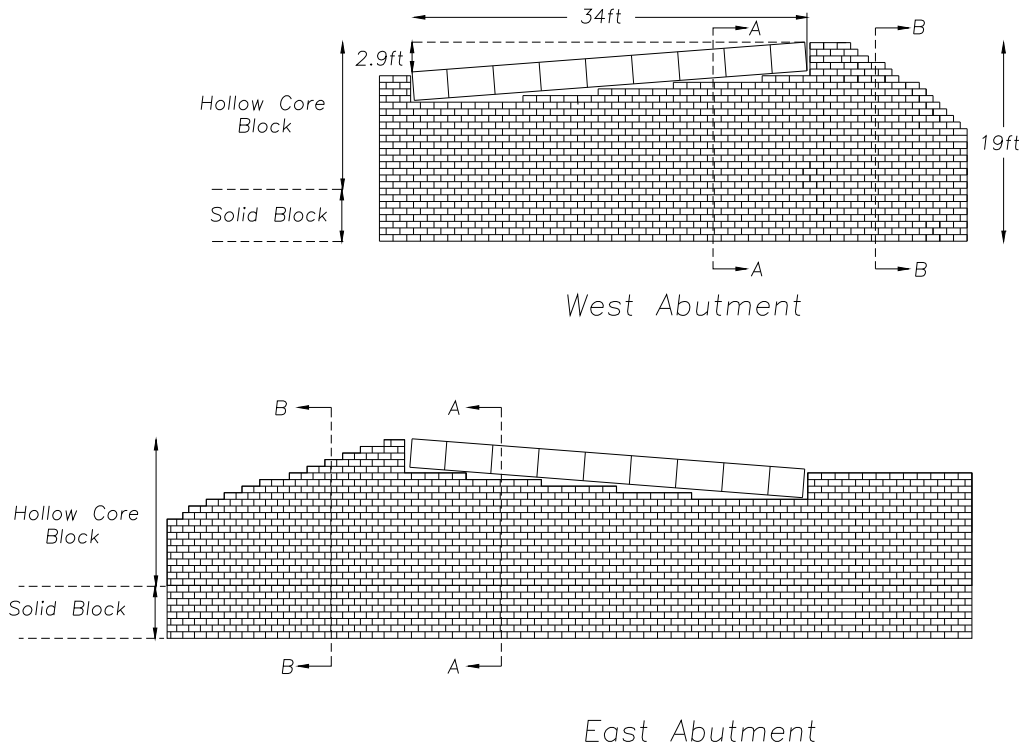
Face View of GRS Abutments to Show Bridge Super Elevation
